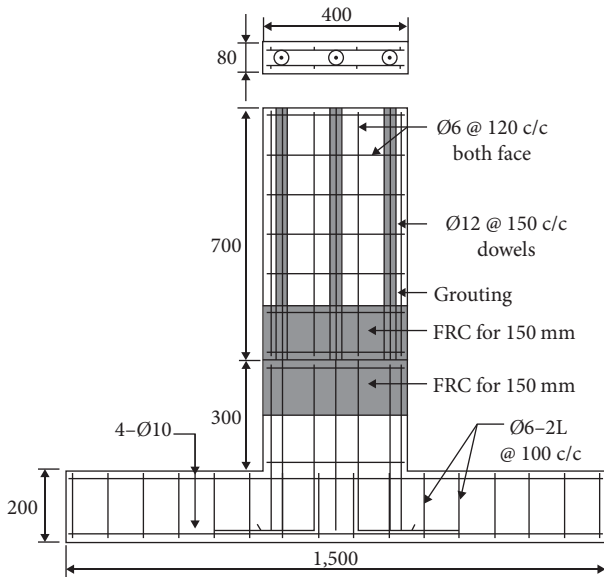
Precast wall panel—slender 2 (PWS2).
